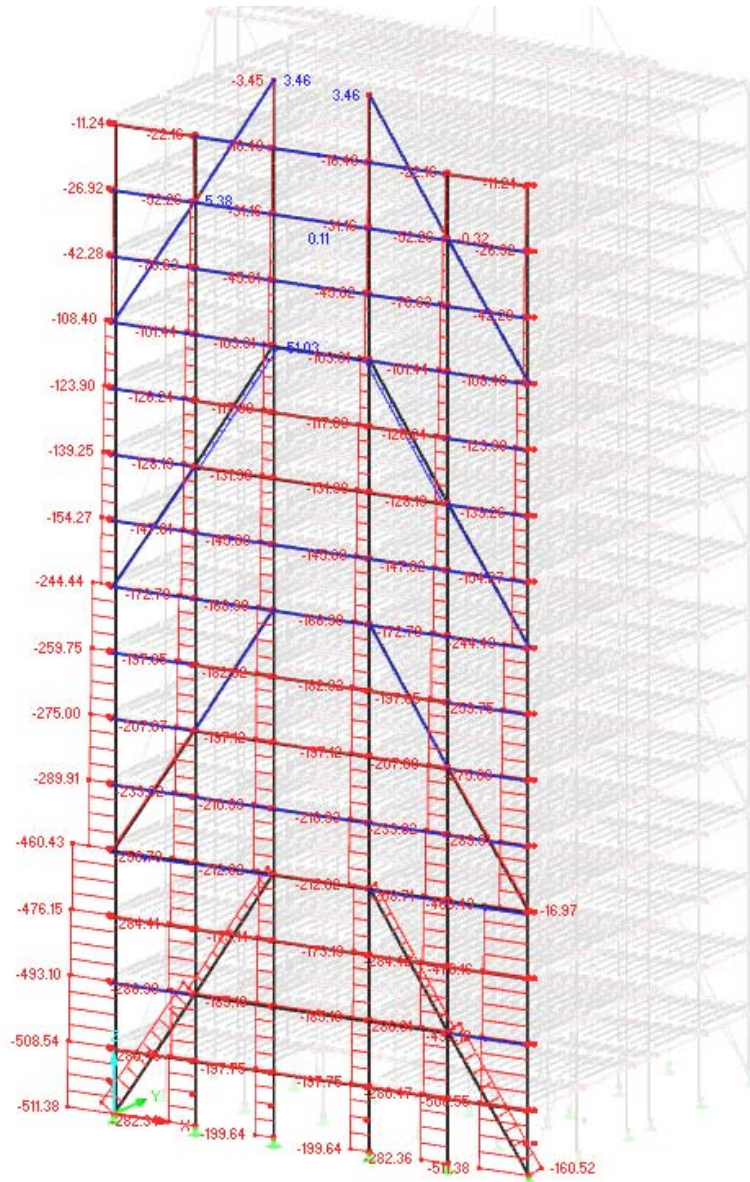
Internal normal forces in the columns of the frame construction in the first storey for LC4 (wind from the side) in [kN]
